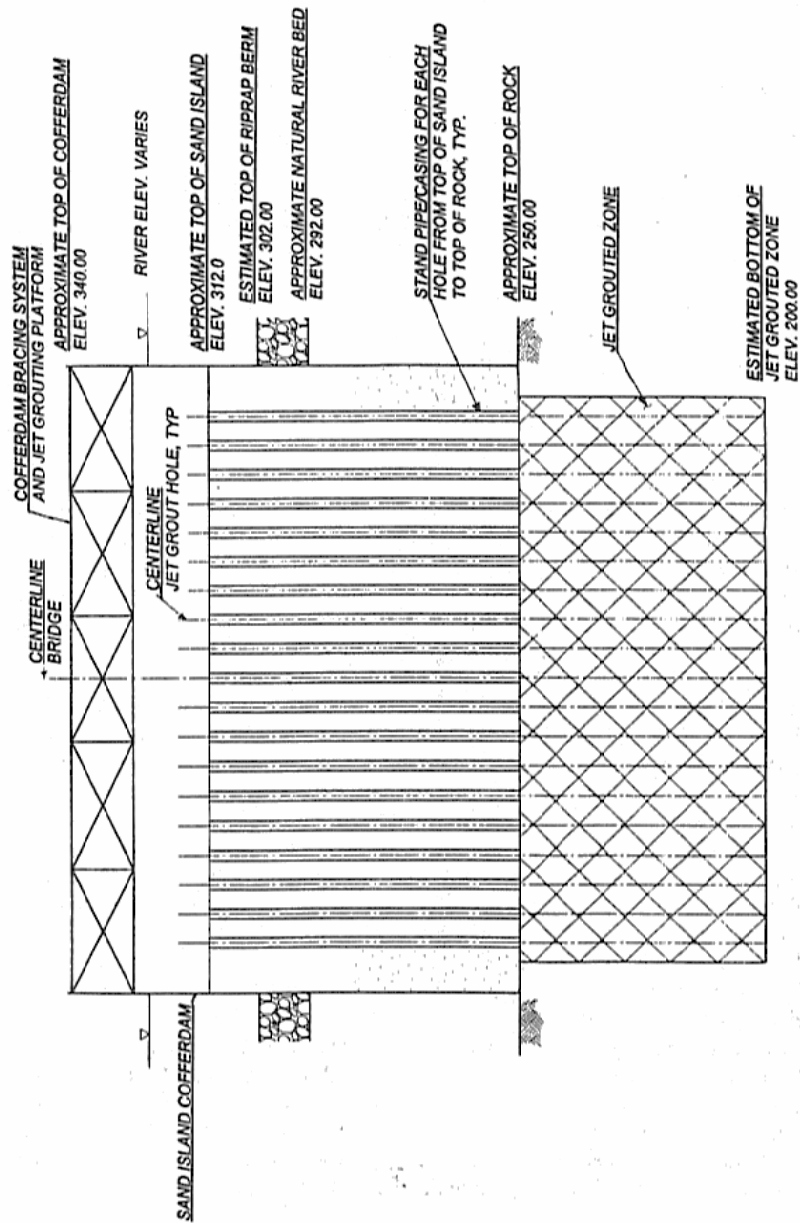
Elevation of treatment, from cofferdam, through water and sand island.
